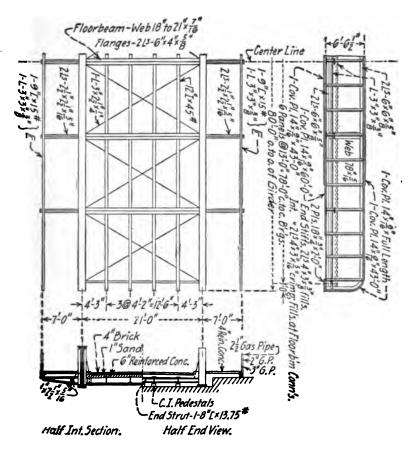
Highway Through Plate Girder Bridge with Solid Floor. (American Bridge Company.)
